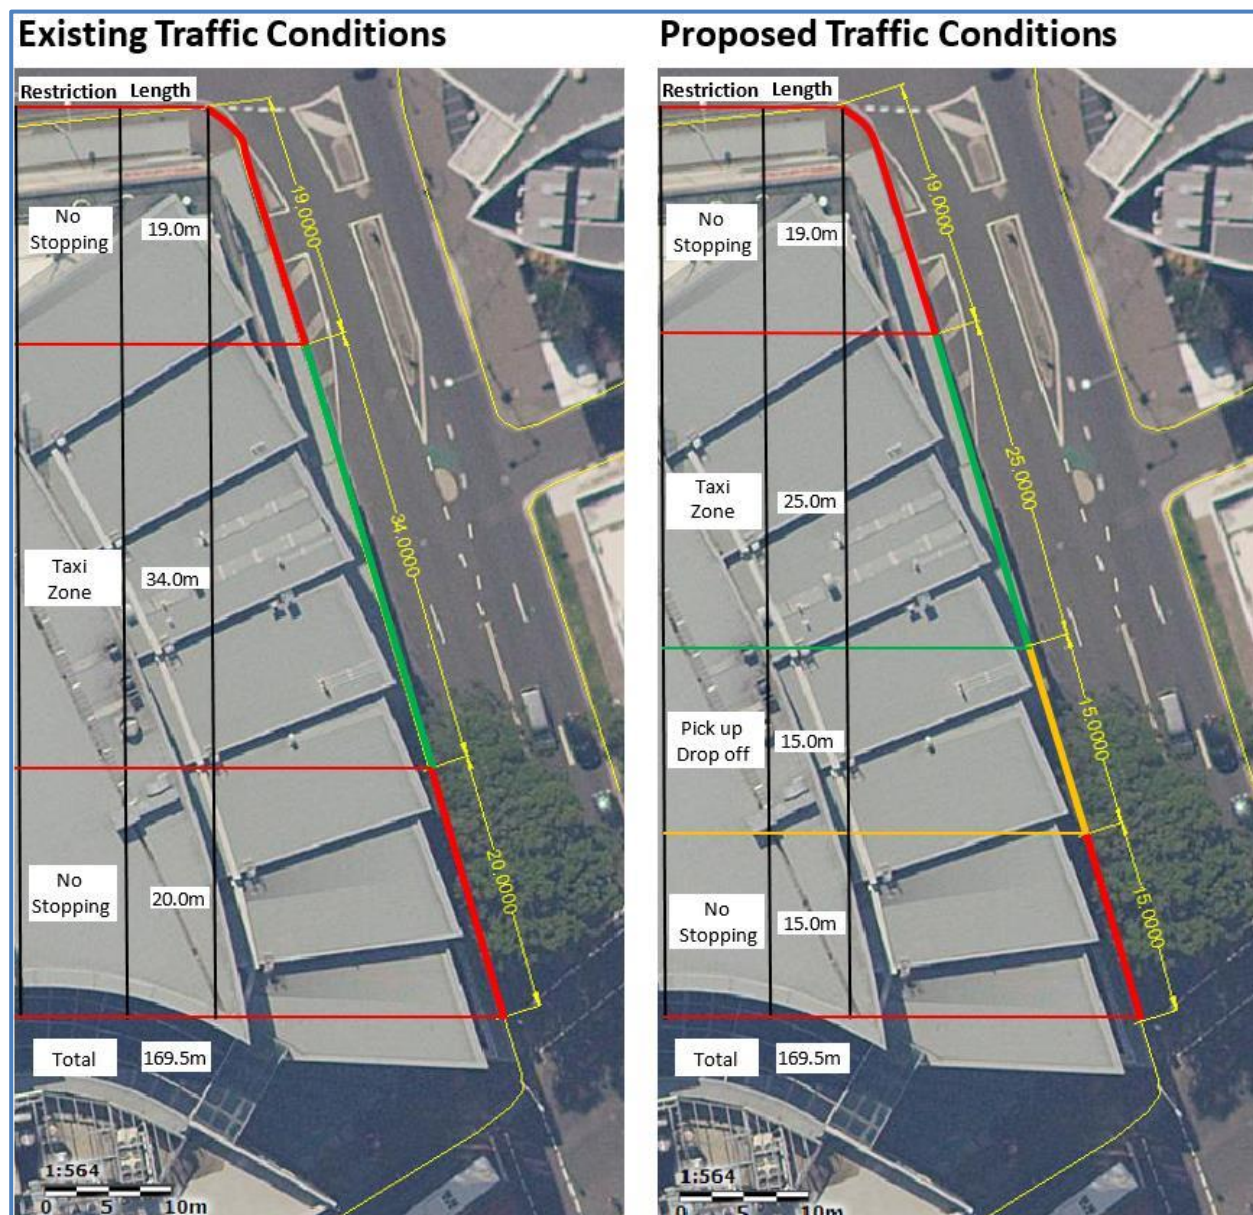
Proposed pick-up / drop-off Bay 7 on Adelaide Street
